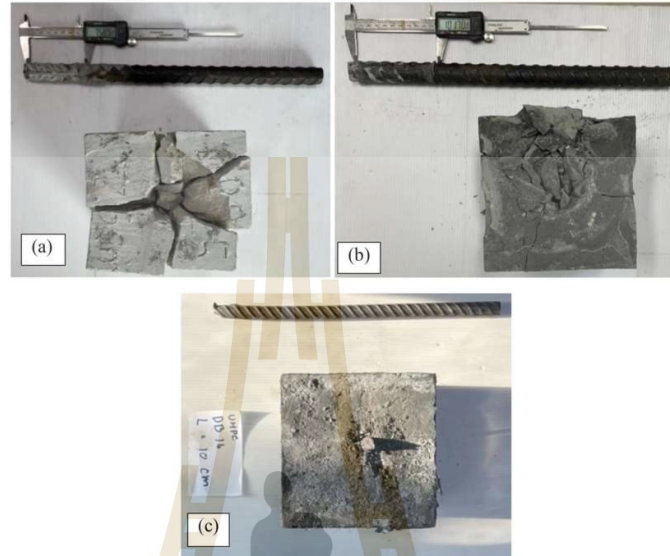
Failure modes of (a) Normal concrete, (b) UHPC with bond failure and (c) UHPC with steel bar rupture.
